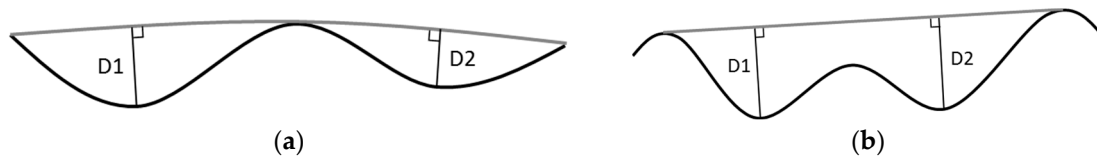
Rutting depth measurement example. (a) Center elevation higher than sides; (b) Center elevation lower than sides.
